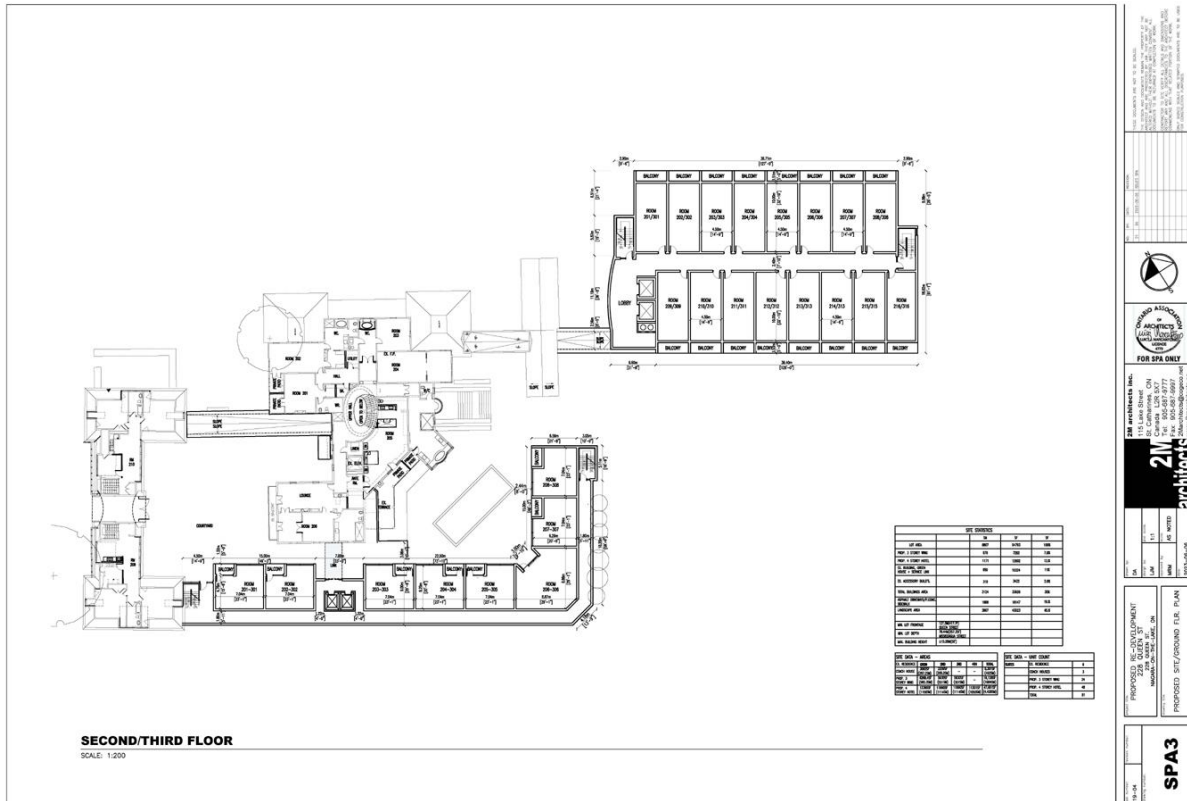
Site Plan, Second/Third Floor, 2M Architects (APPENDIX II)
